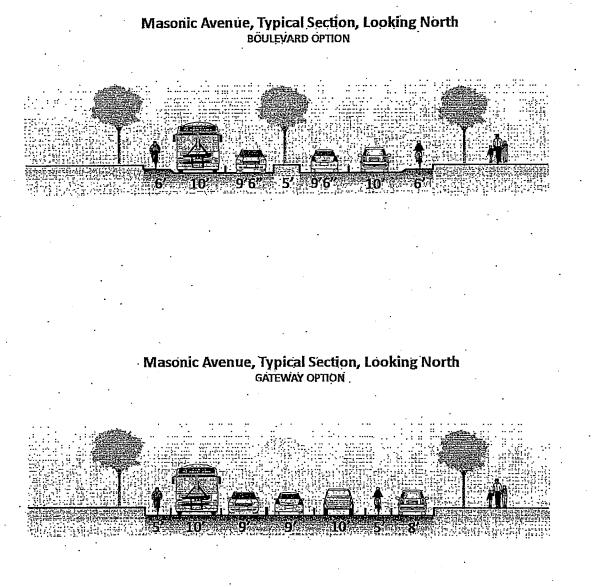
Modified Project 3-2 Cross Sections: Boulevard and Gateway Designs
